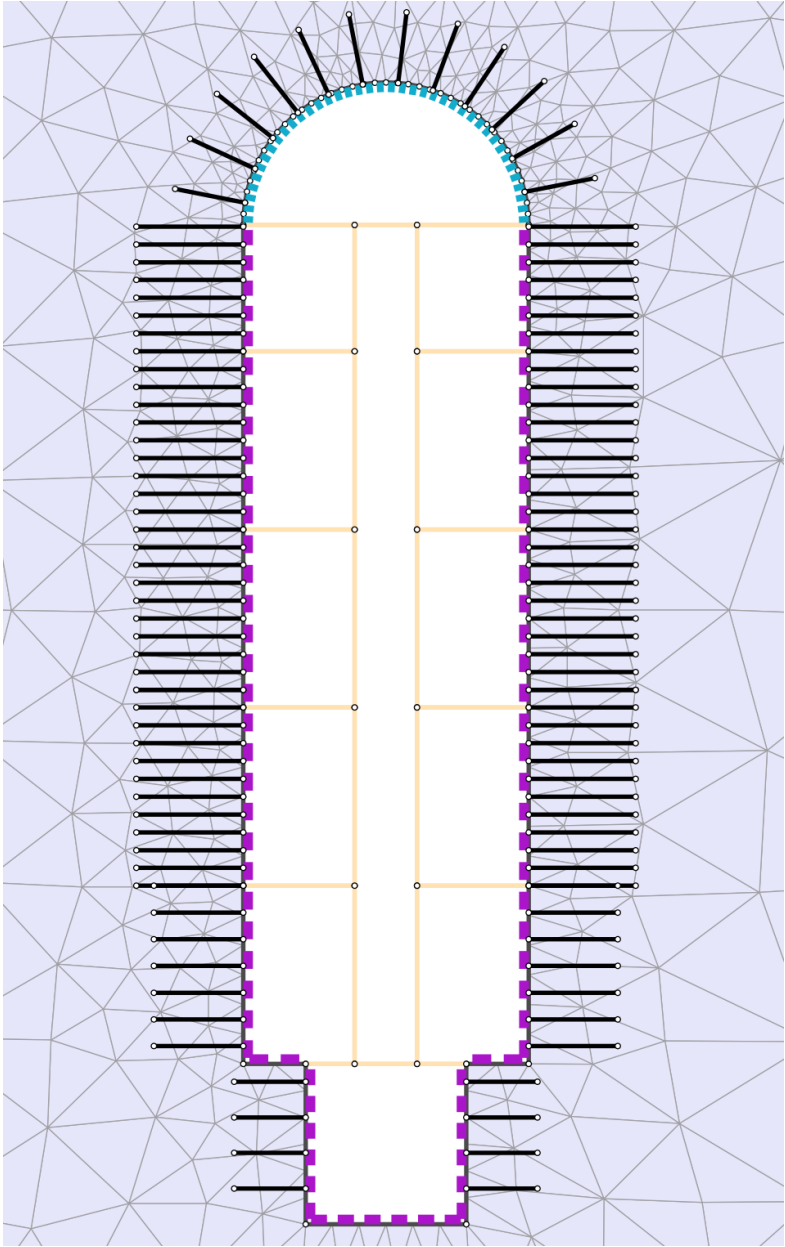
Installation of rock bolts, shotcrete and concrete
